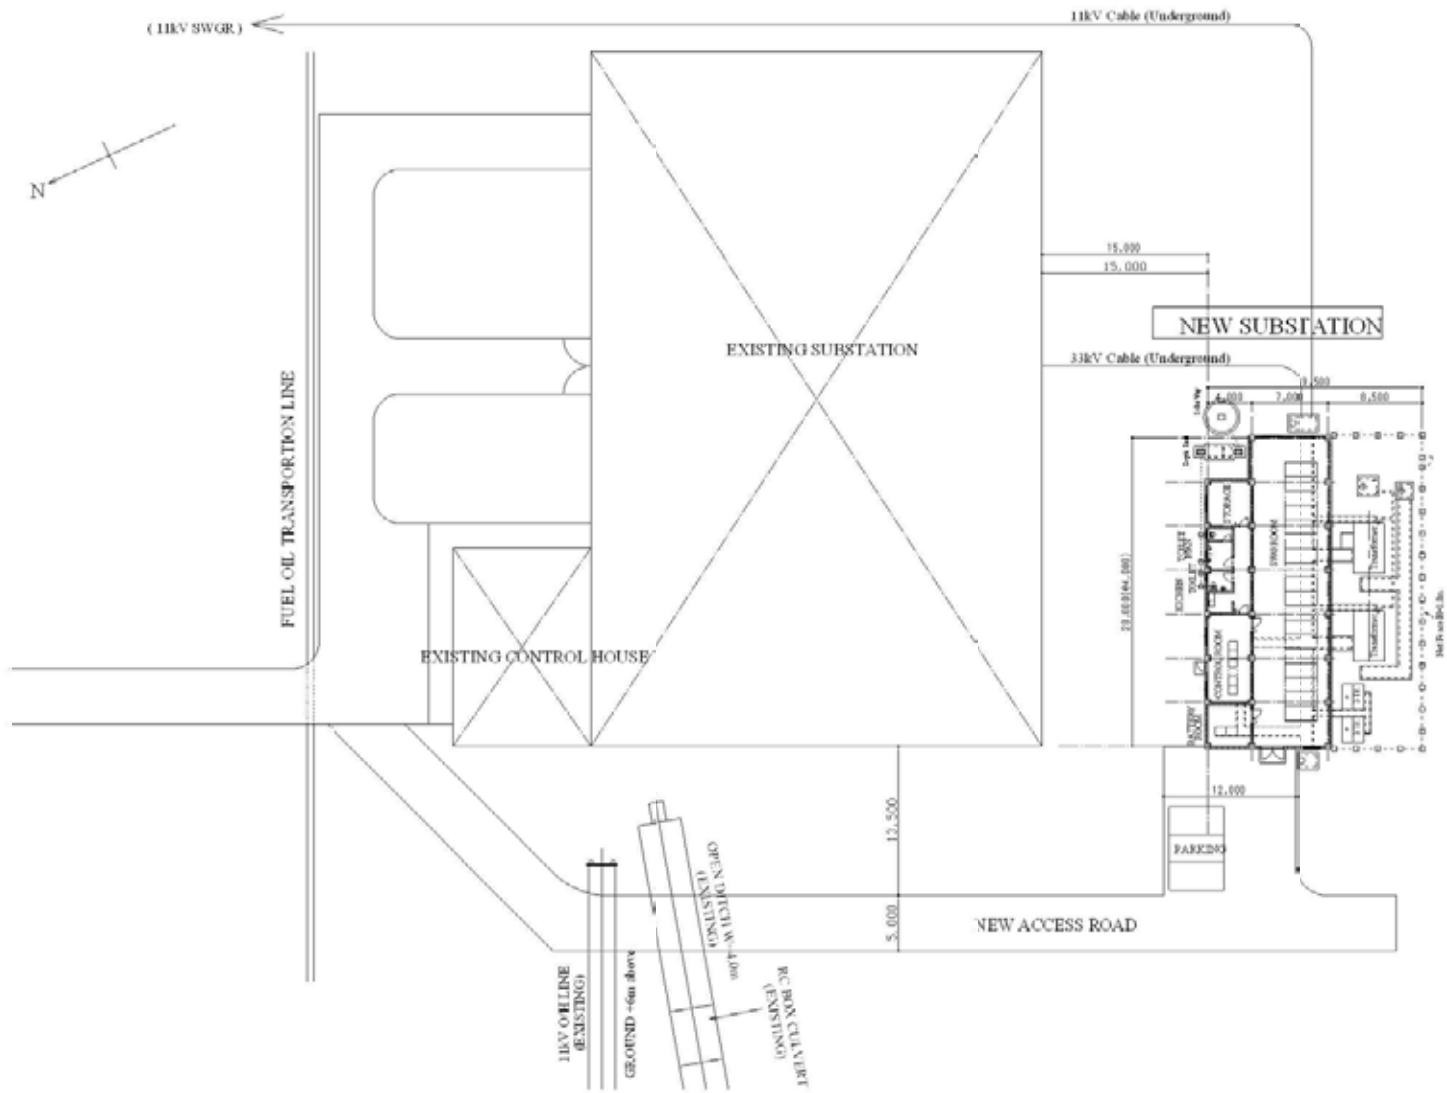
Layout Plan of New Substation (Mtoni)
